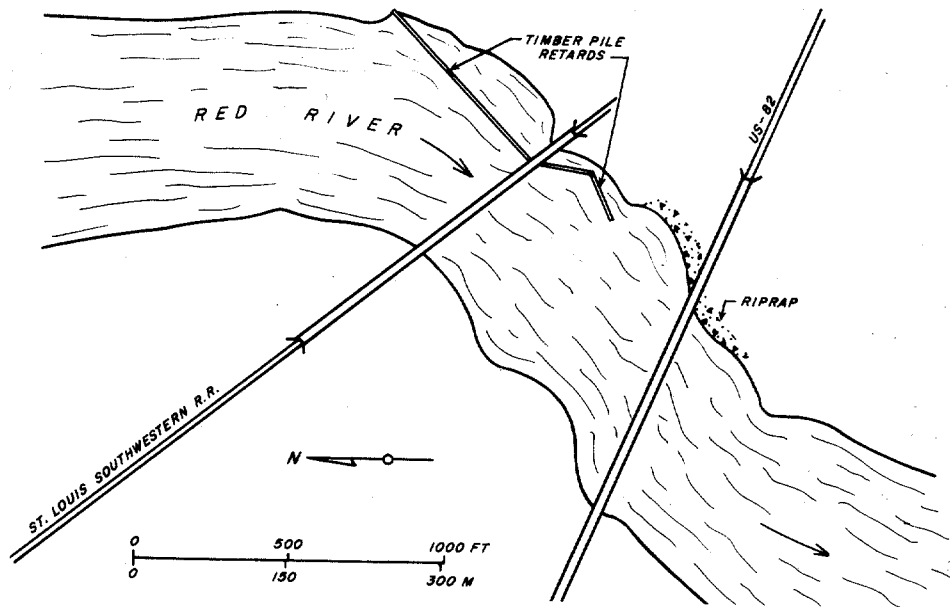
Plan sketch showing countermeasures at US-82 crossing. (Traced from aerial photograph taken in in 1974.)
